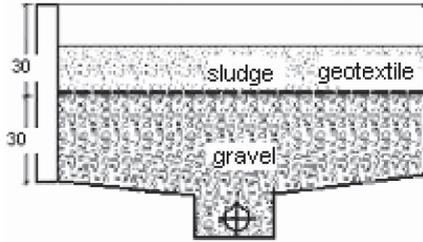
Cross section of the dewatering system (adopted from Mendonça, 2003).
